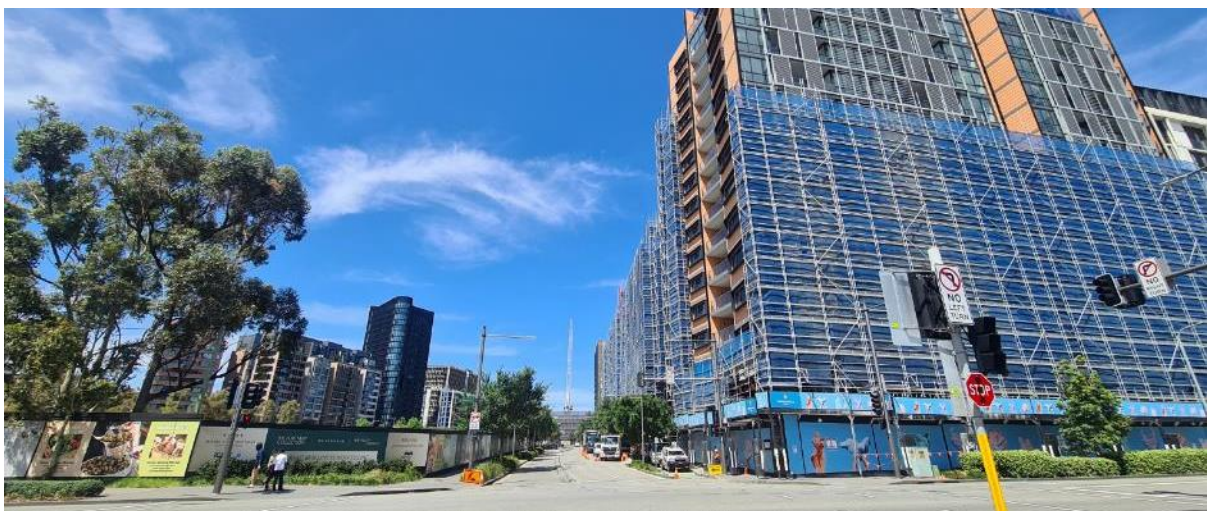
View looking east to 499 Botany Road, the 'Alba' development by 'Bridgehill'
